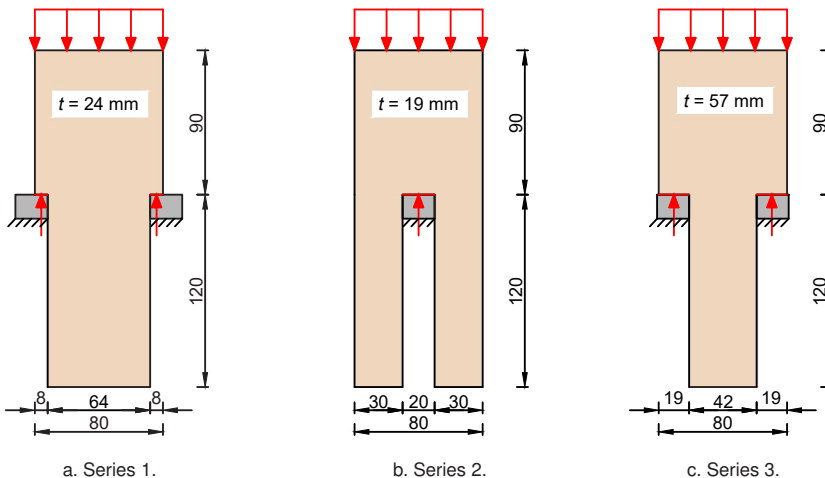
Schematic embedment test setups with external and internal rectangular fasteners, in mm.
